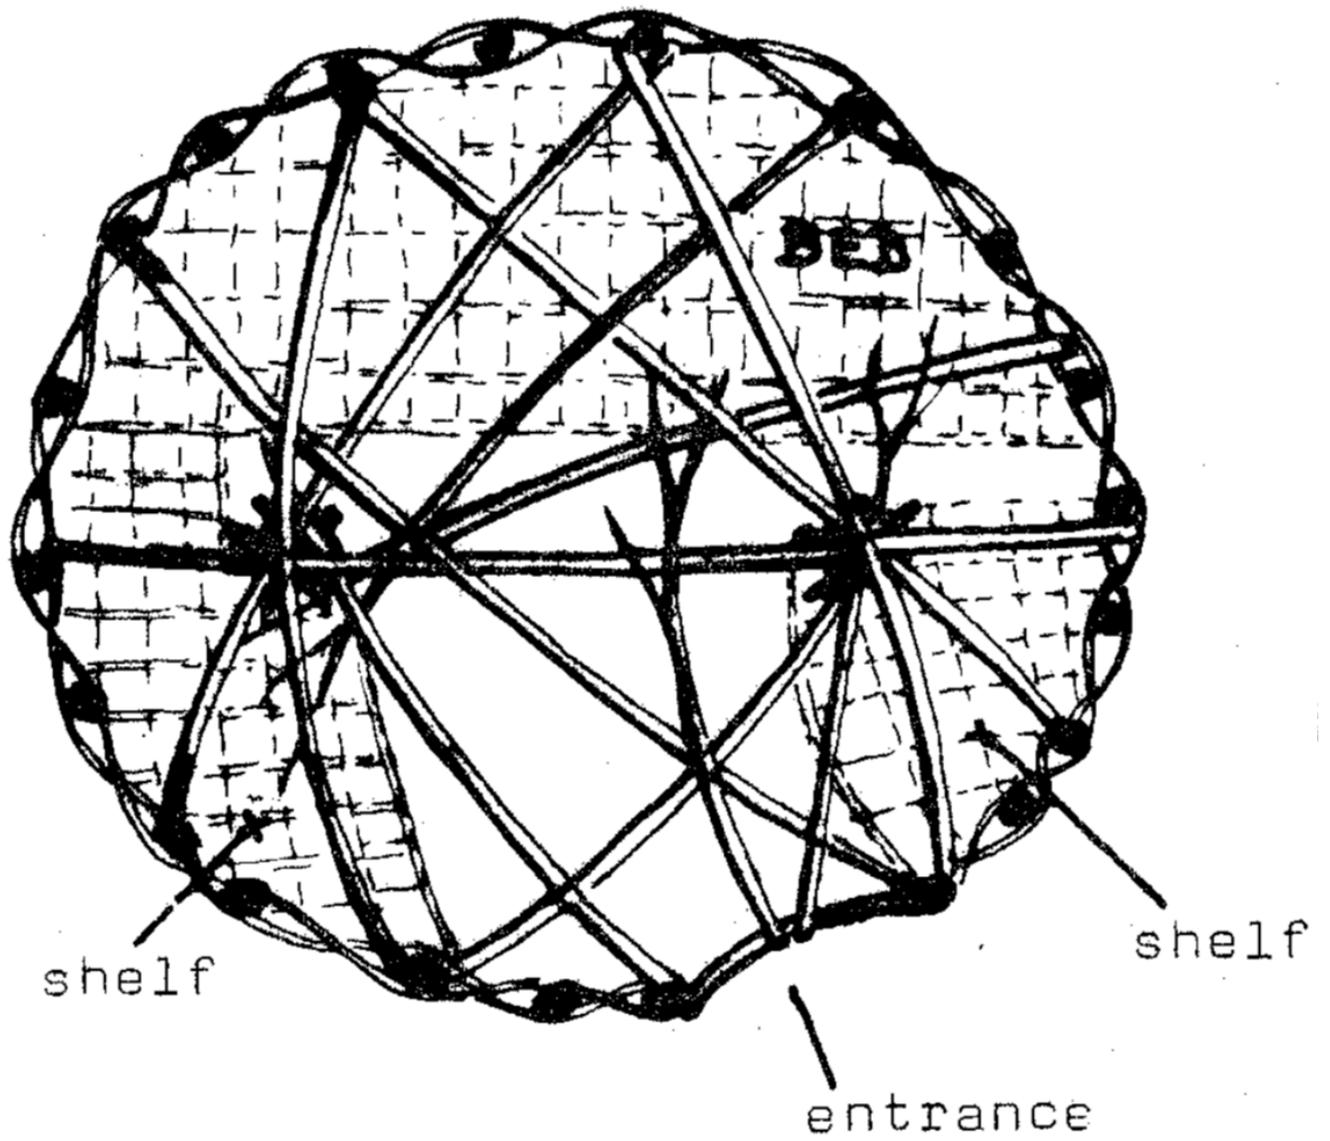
FLOOR PLAN OF HUT F. DRAWING FROM HORREÛS DE HAAS 1978, P.73.
